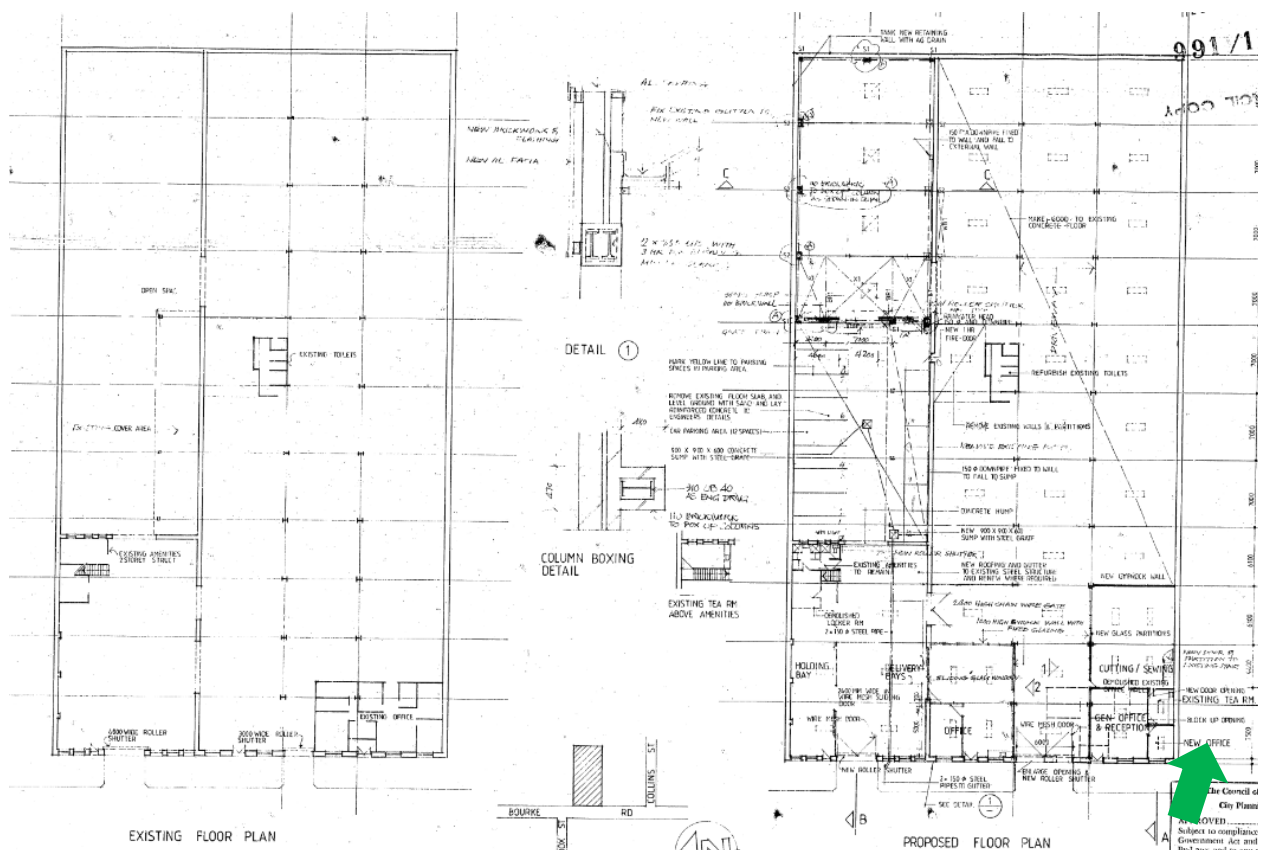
Detail from 1987 plans showing alterations to interior of subject site. The green arrow indicates north.
